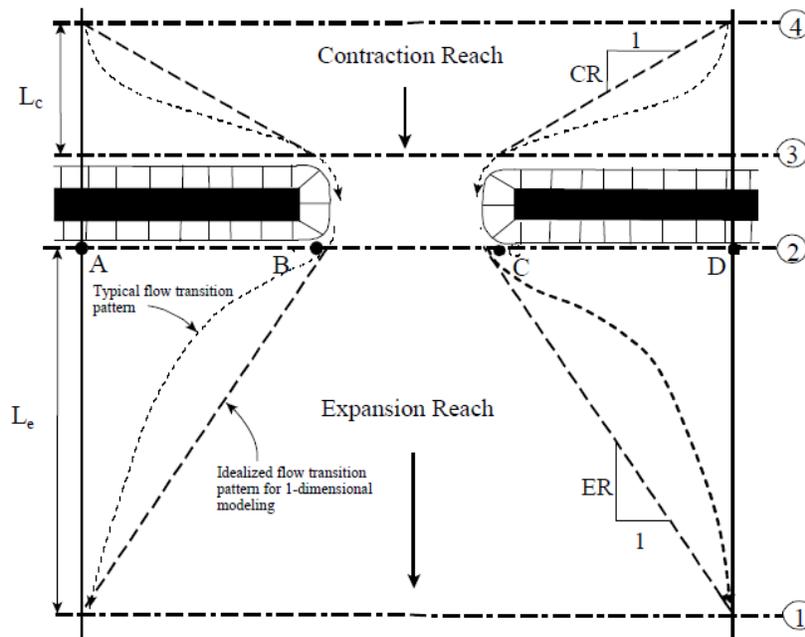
Cross Section Locations at a Bridge or Culvert
